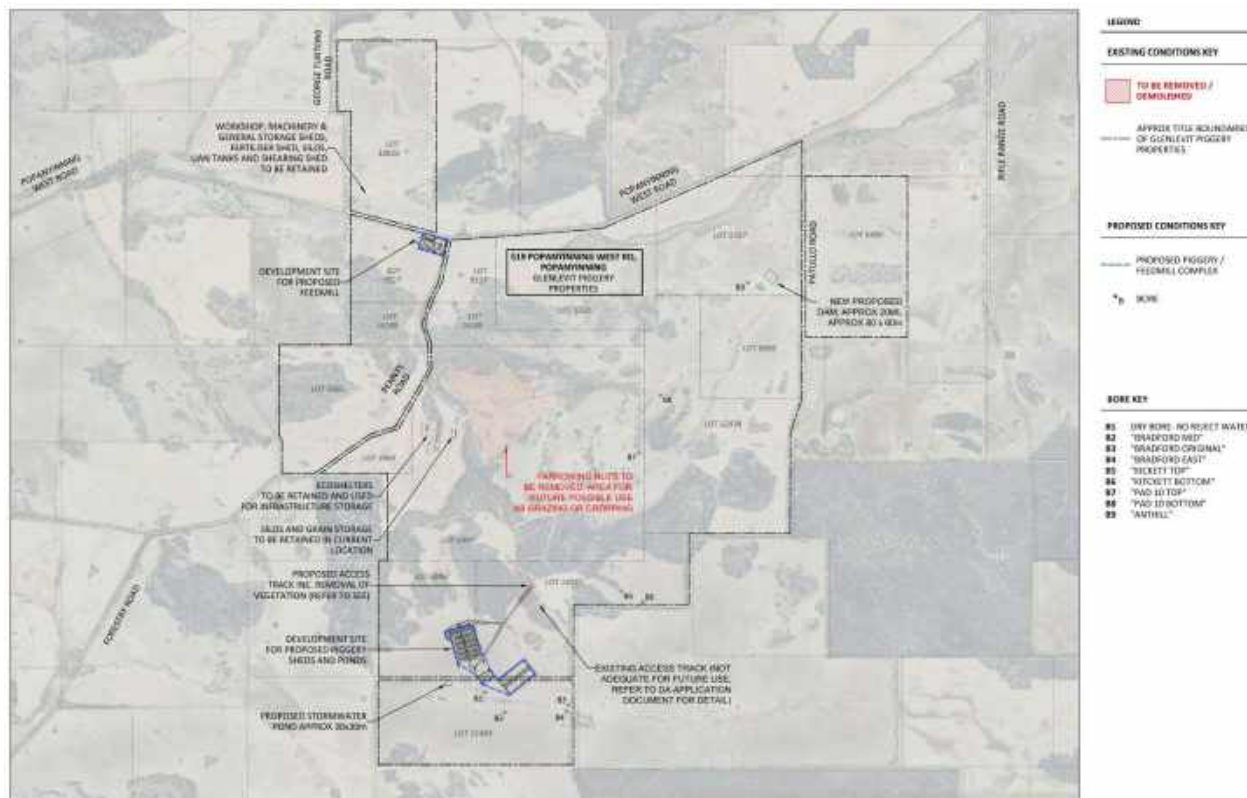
Site conditions including structures to be removed, and proposed location of new piggery buildings and feed mill. Refer Drawing SCL25-23-DA02. Drawing not to scale.
